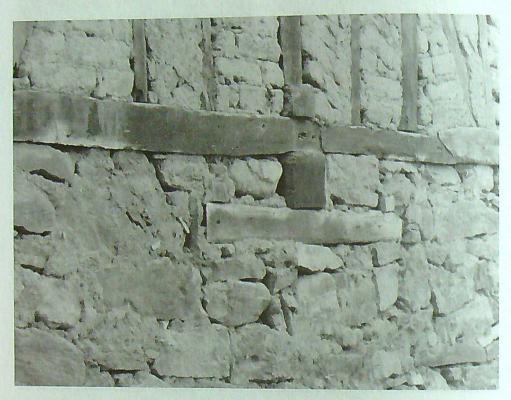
Stone, Wood and Adobe (Z. S. Perker)
